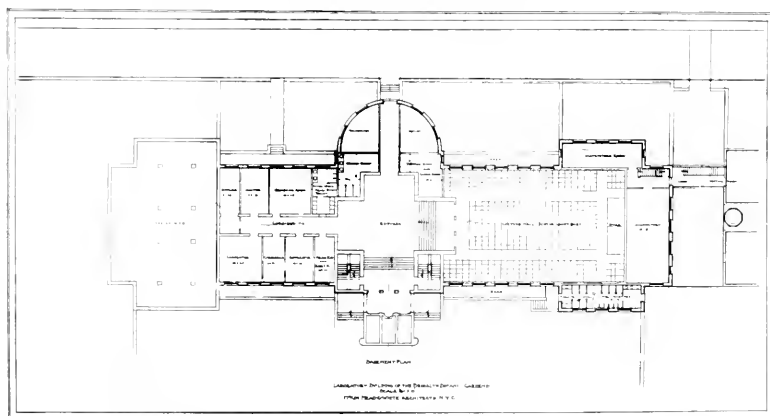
LABORATORY AND ADMINISTRATION BUILDING. Plan of the basement. In the final plans the northeast "Instructors' Room" has been divided into three smaller rooms.
